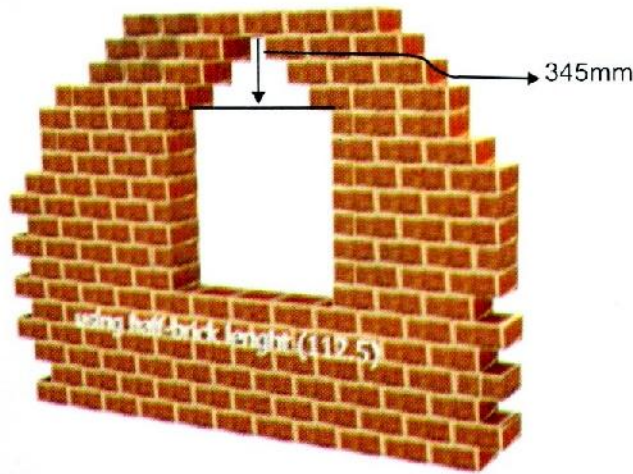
Corbelled brick cantilevered at 112.5mm (half brick length).
